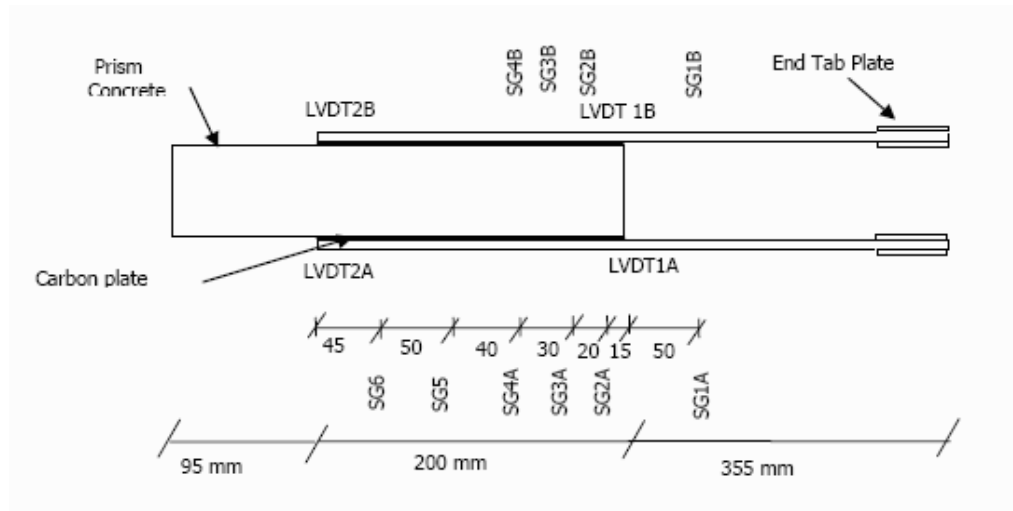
Dimension and instrumentation arrangement (AbuHassan, 2006)
